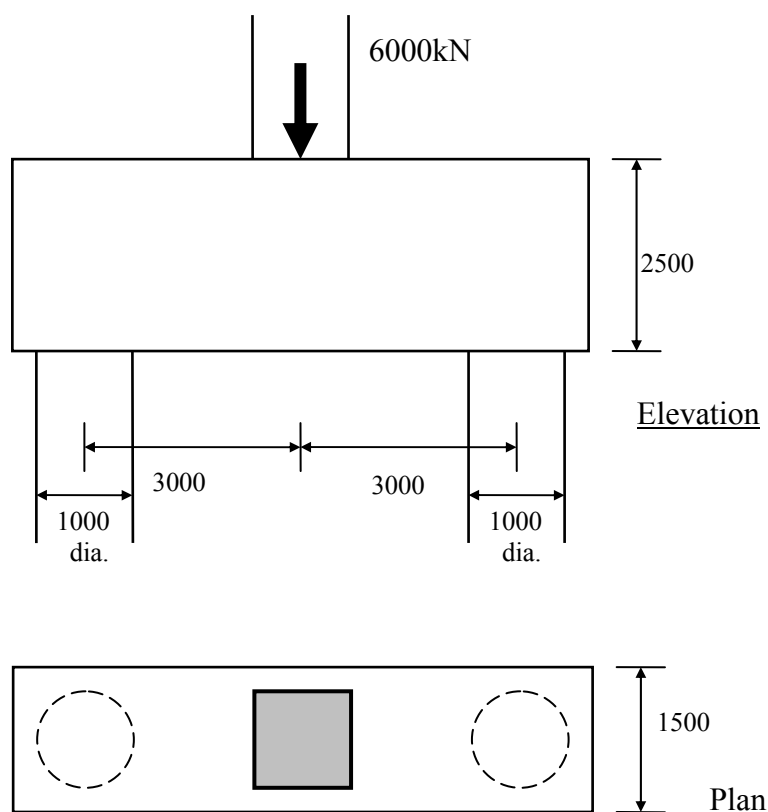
Pile Cap Layout of Worked Example 12.2
